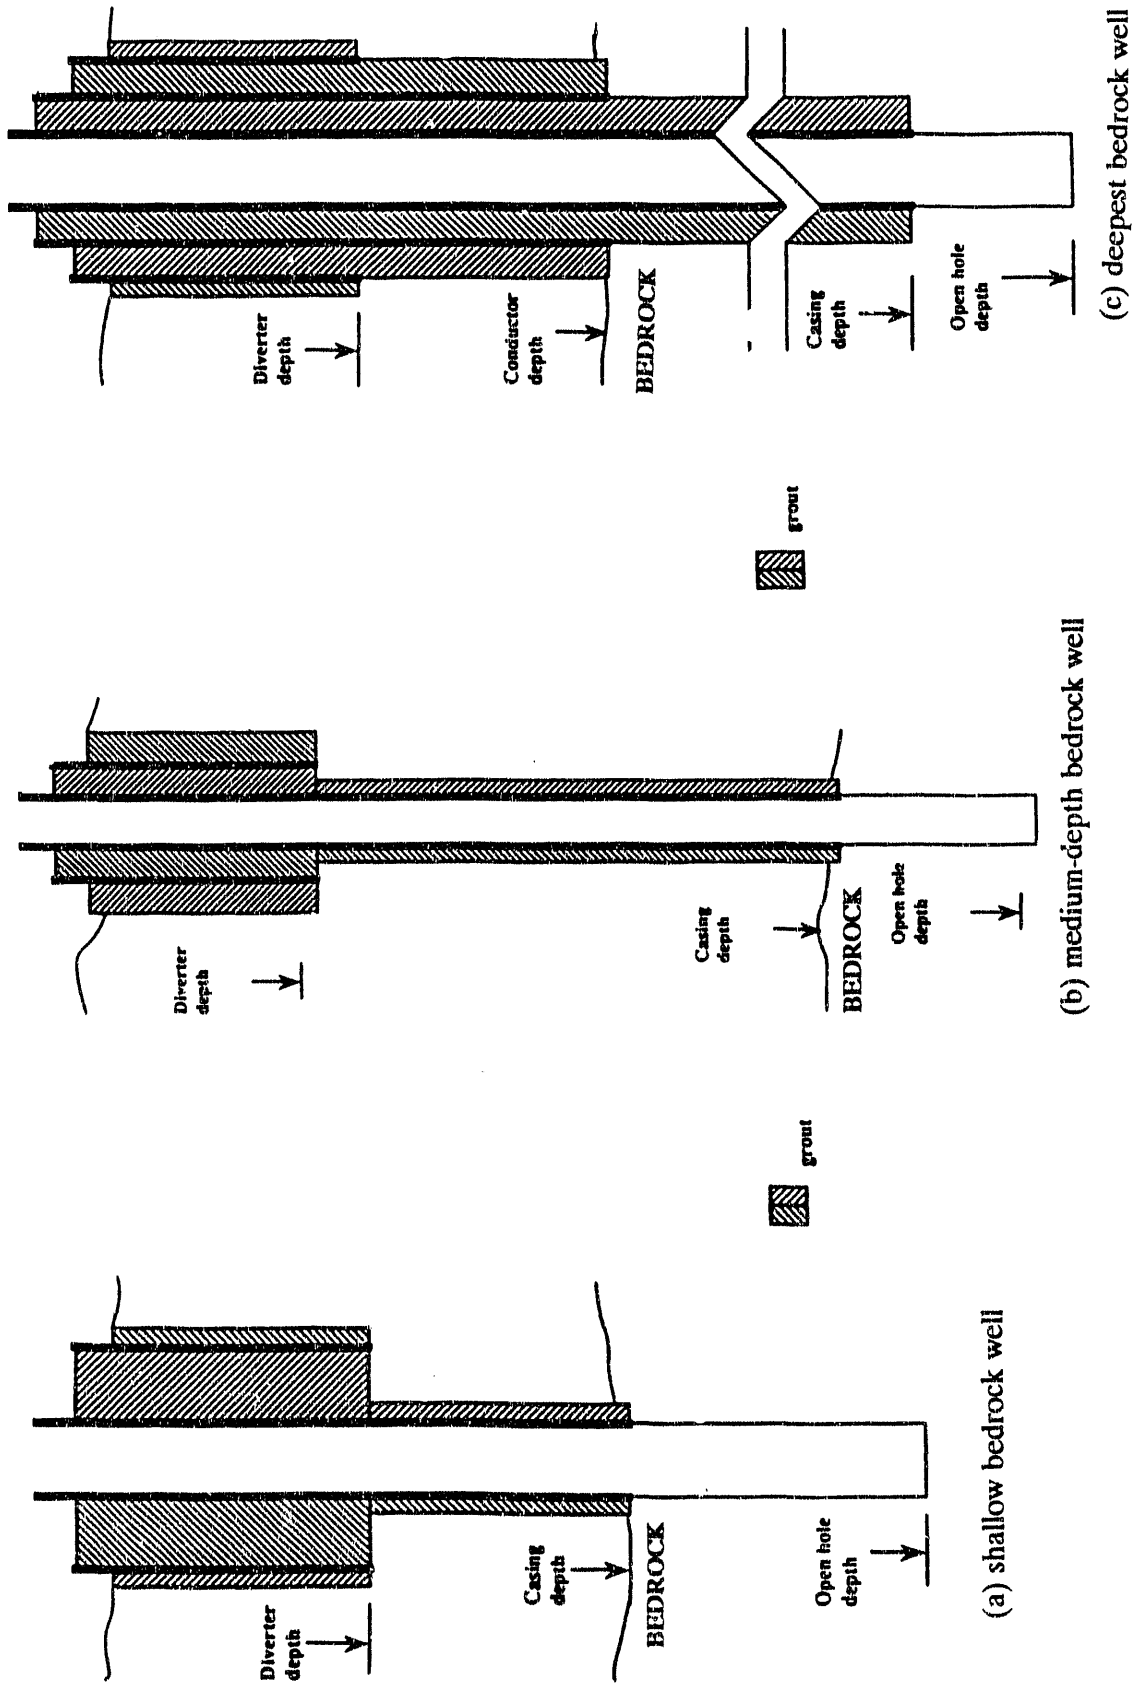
Construction diagram of hydraulic head, open-interval bedrock well installations.
